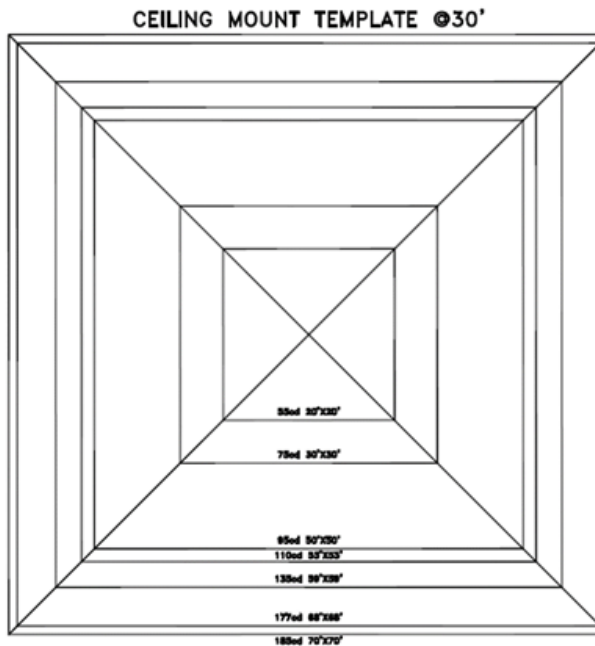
Ceiling mounted fire alarm coverage template at 30 feet high
